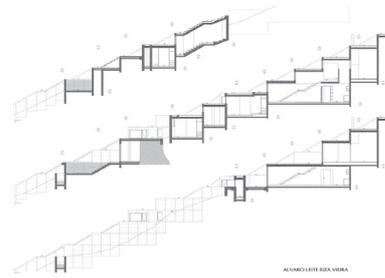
Front view and sections of Tóló house (FG, 2009)
